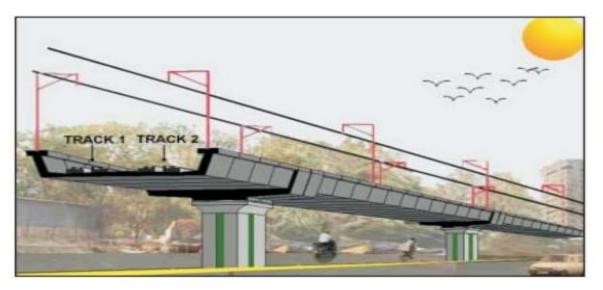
U-Girder (Precast Segmental) Supporting 2 Tracks
